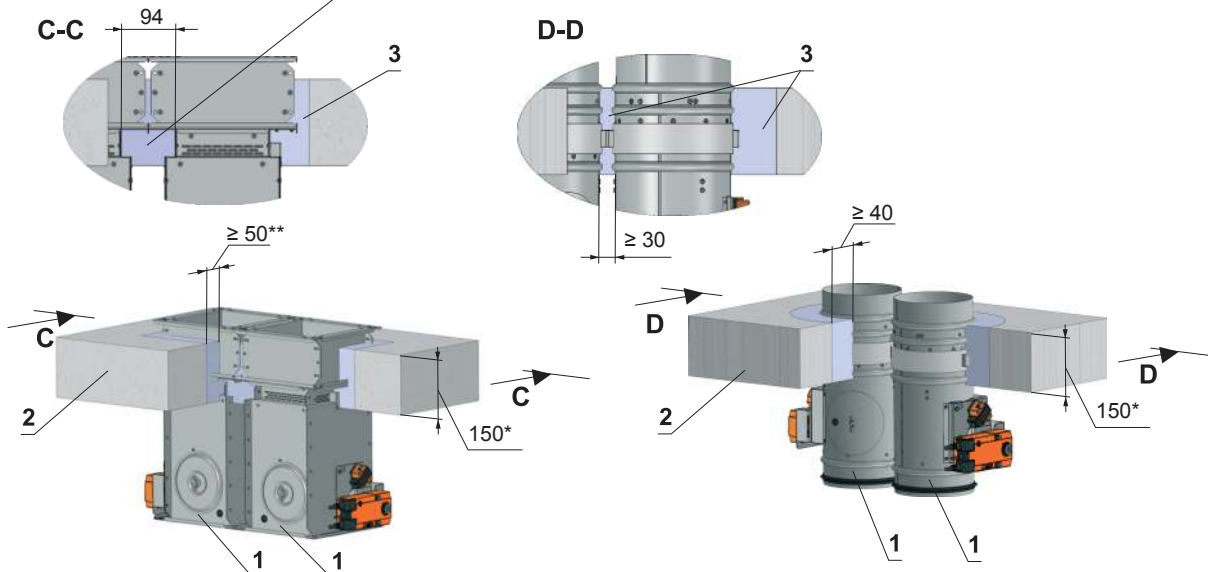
Solid ceiling construction - flange to flange - mortar or gypsum
